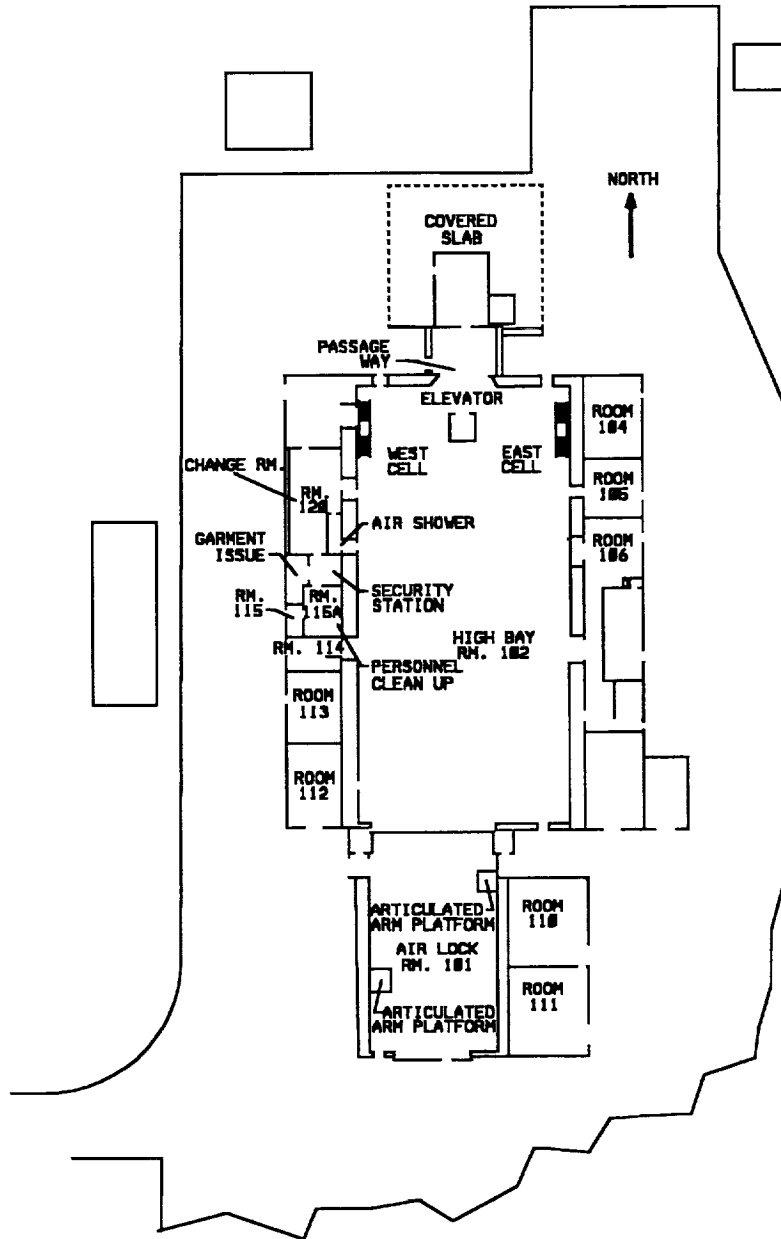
VERTICAL PROCESSING FACILITY, FLOOR PLAN
